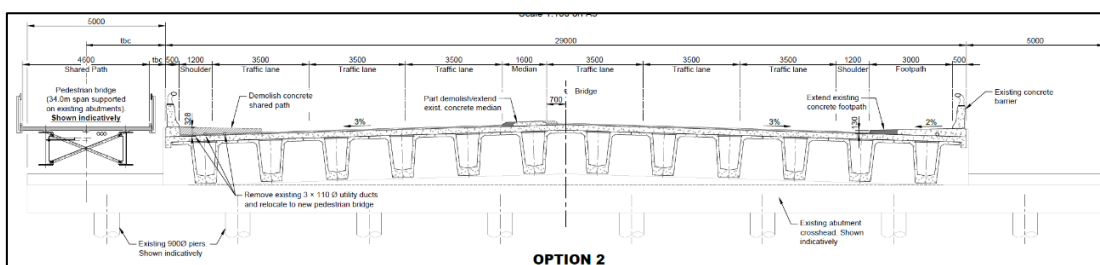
Proposed Configuration of PEI Bridge (Source: Tiaki Consultants Report – Appendix 10. The cross section is a view of the bridge looking towards the south)
